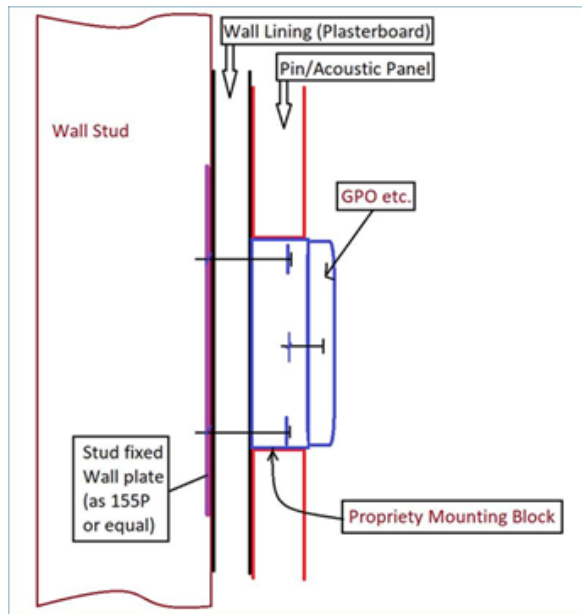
Mounting block detail for electrical accessory installed in the location of a display board, whiteboard or writeable surface.
